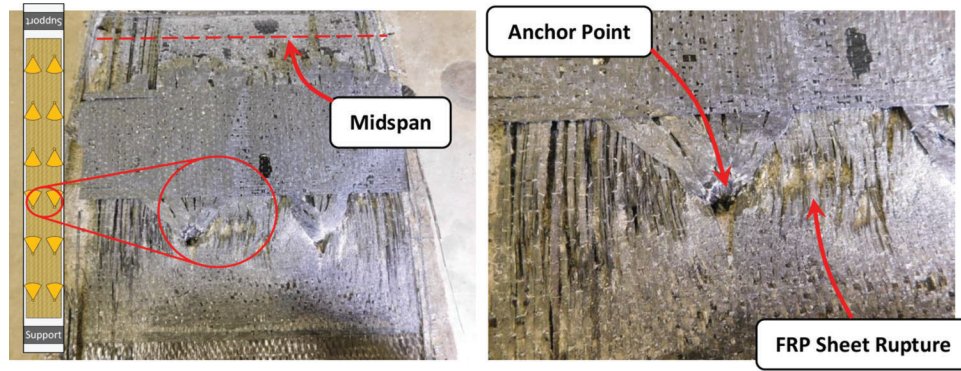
Typical FRP sheet rupture at anchor point—EB.1 specimen.
